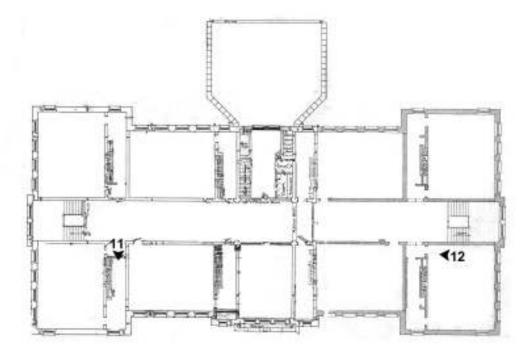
Photo Map (Second Floor). Historic plans identical to current plans.
